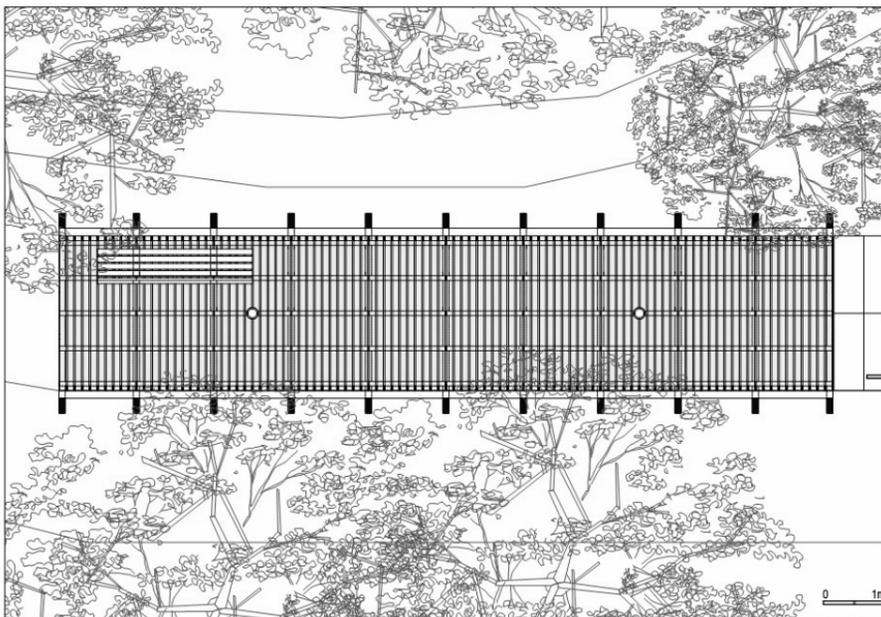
Plan of the gazebo (Source: Archdaily, 2012)
